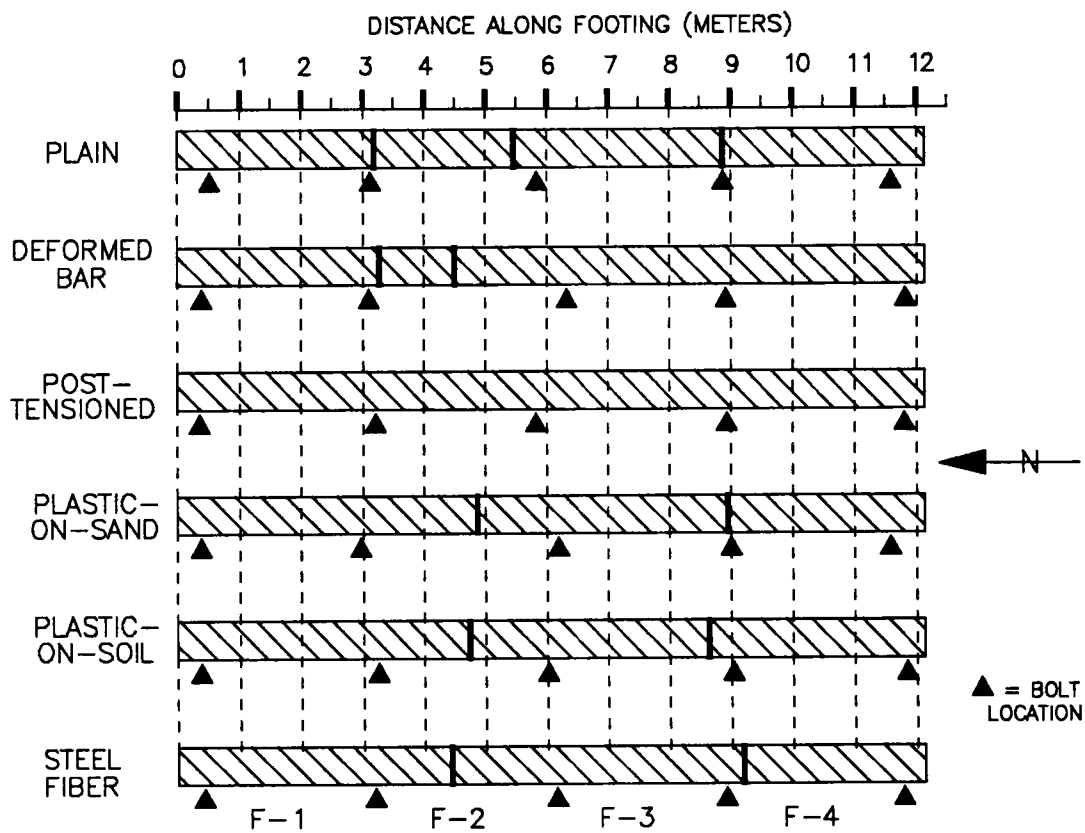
Day 91 Tension Zone Footing Crack - Extensometer Segment Location
